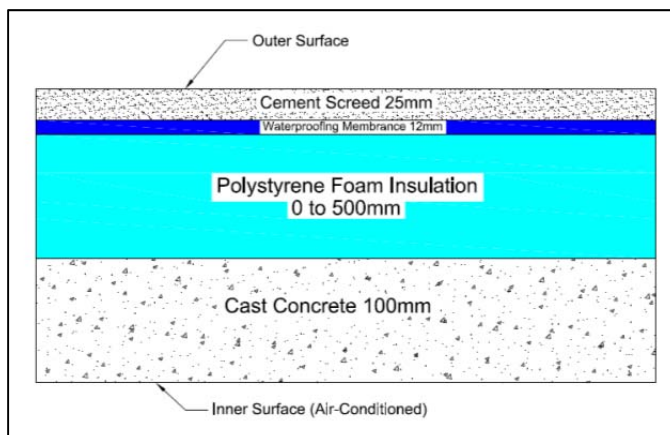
Cross-Section of a Flat Roof Construction
